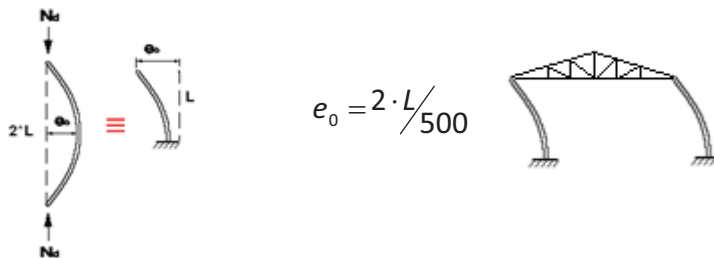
Imperfection e_0 used in battened built-up columns
